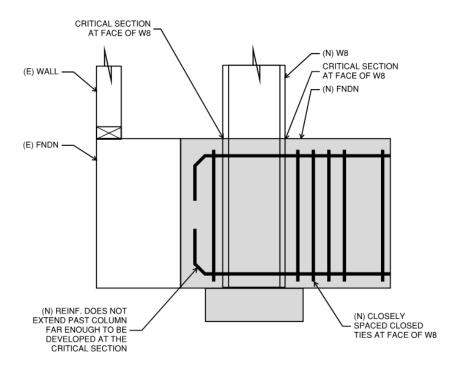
Elevation of new grade beam. Note closely spaced ties are added at each face of the W8 columns.
